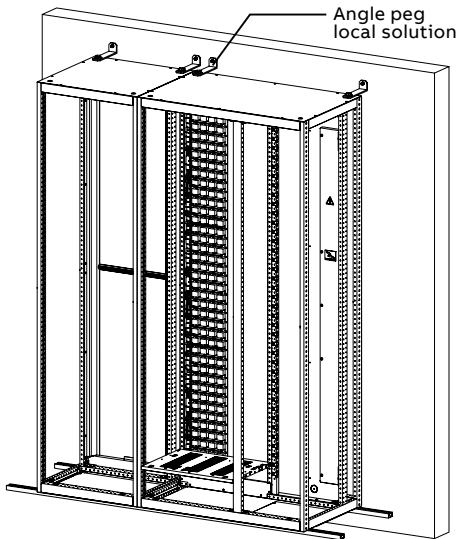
Fastening to foundation – HALFEN channel / each section fixed in 4 points
